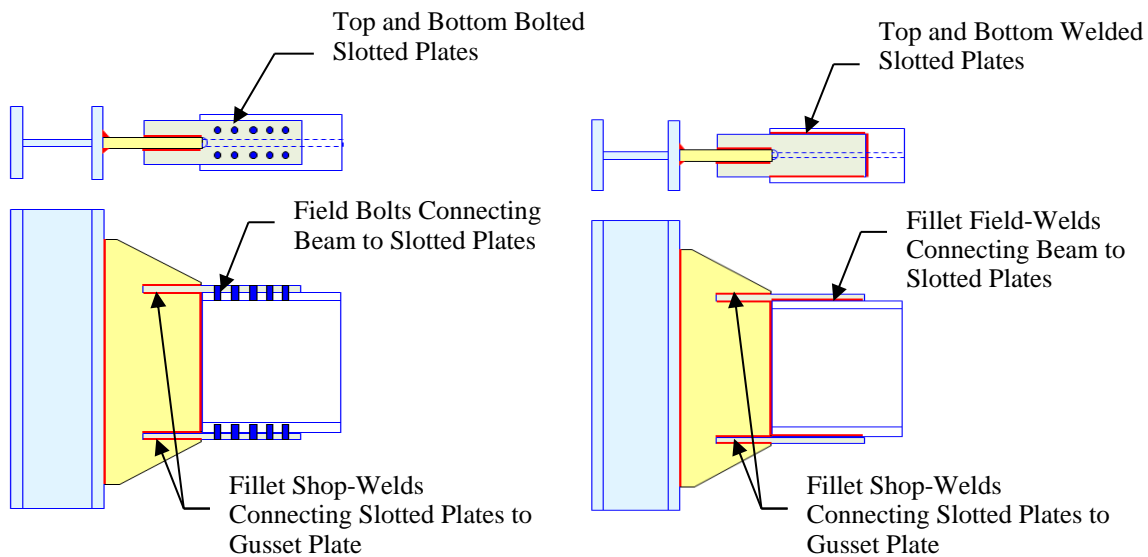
Two viable alternatives for beam-to-gusset plate connection details
